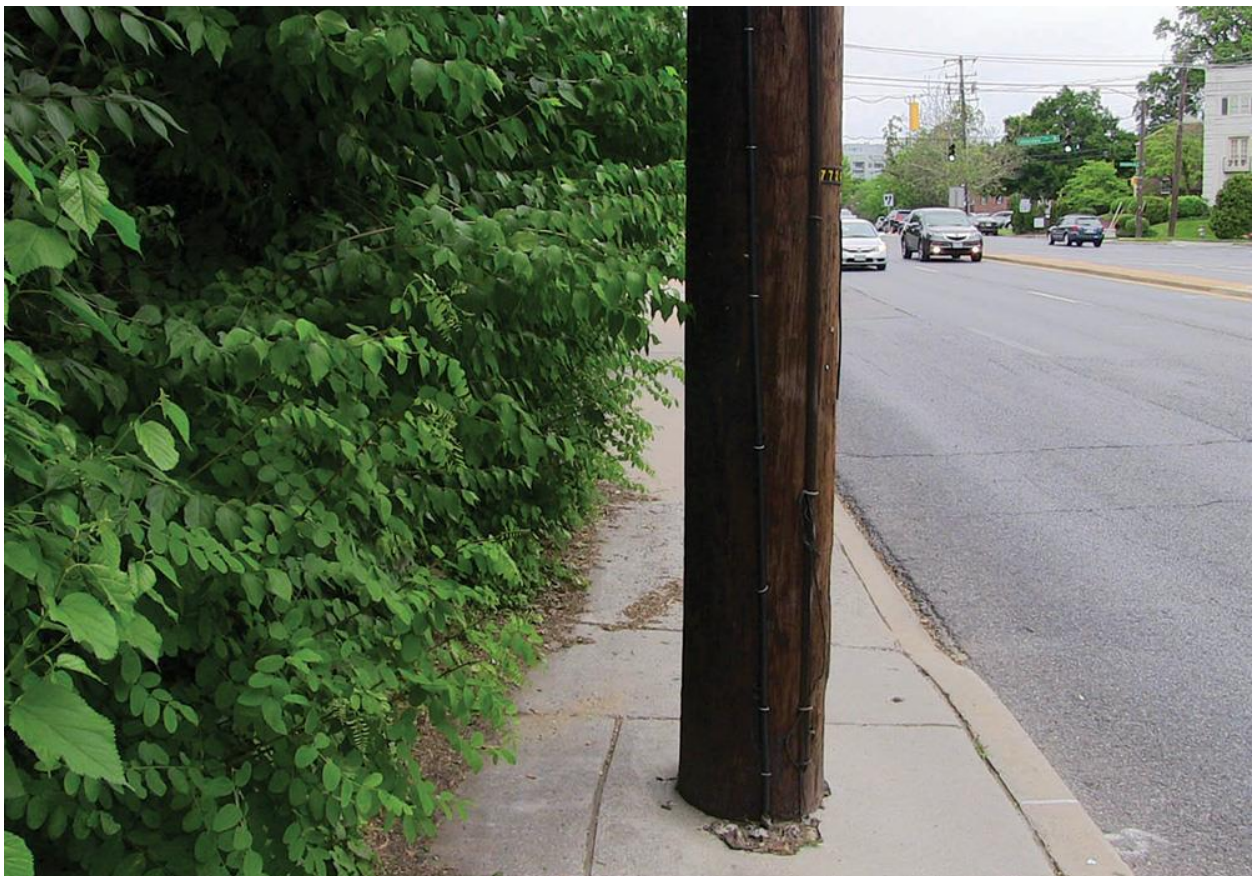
A high-stress sidewalk due to a wide street, narrow sidewalk, overgrown vegetation and poorly placed utilities. The proposed study would identify these problem areas cross the city.
